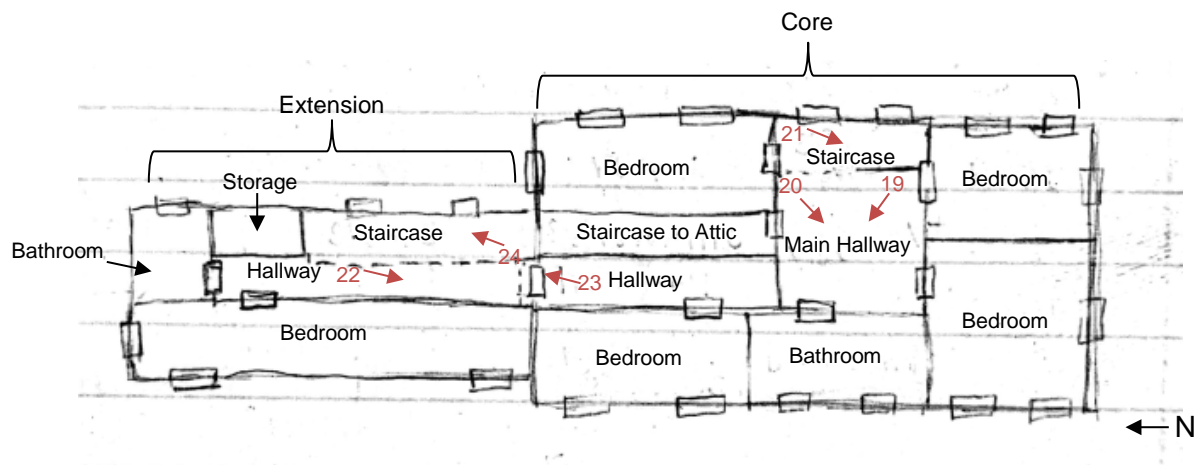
Floor Plan Sketch and Interior Photograph Key of the Second Floor. Sketch not to scale.
